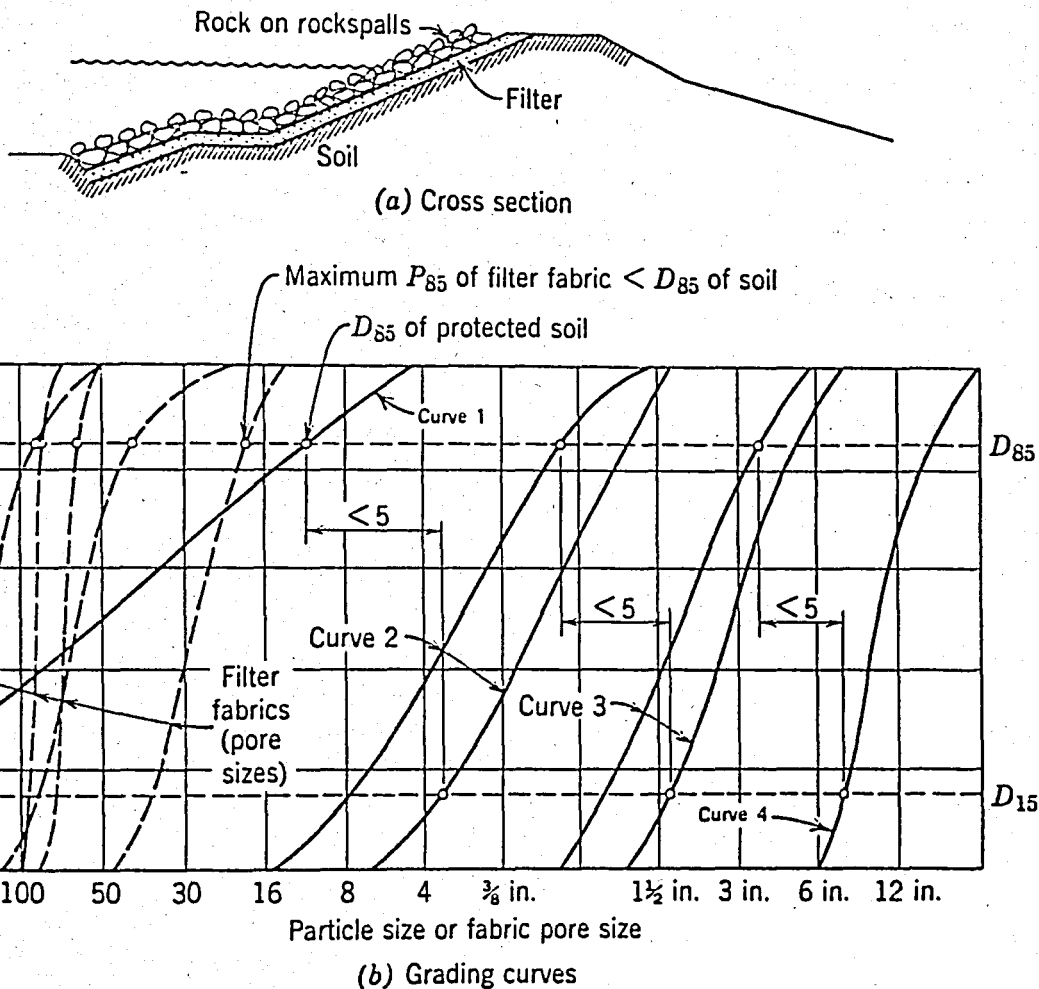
ROCK SLOPE DESIGNED TO PREVENT UNDERMINING.
